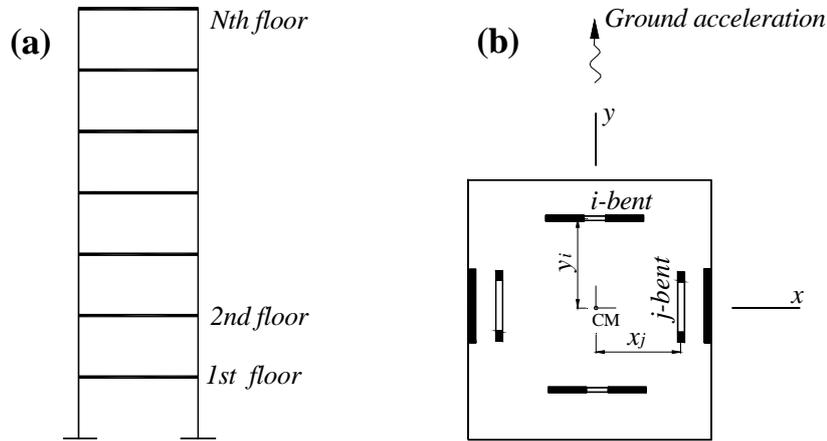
(a) Elevation of a uniform multi-story building with; (b) symmetrical floor plan
